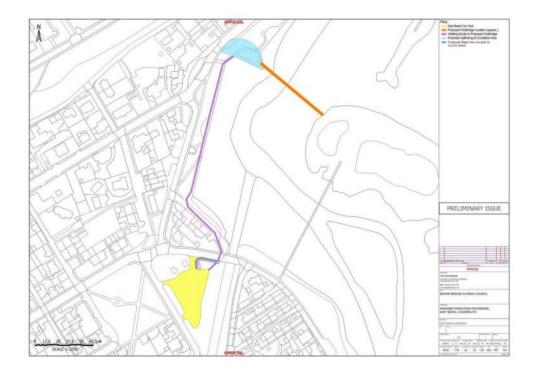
Walking Route from East Beach Car Park to Proposed Bridge
